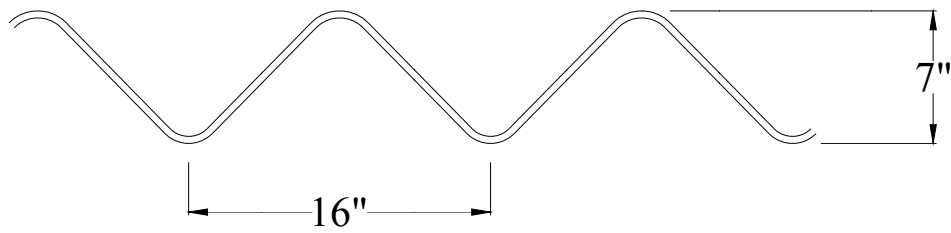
Details of NU-Tie-V4 GFRP connector used for specimens latest specimens with 3in. insulation
